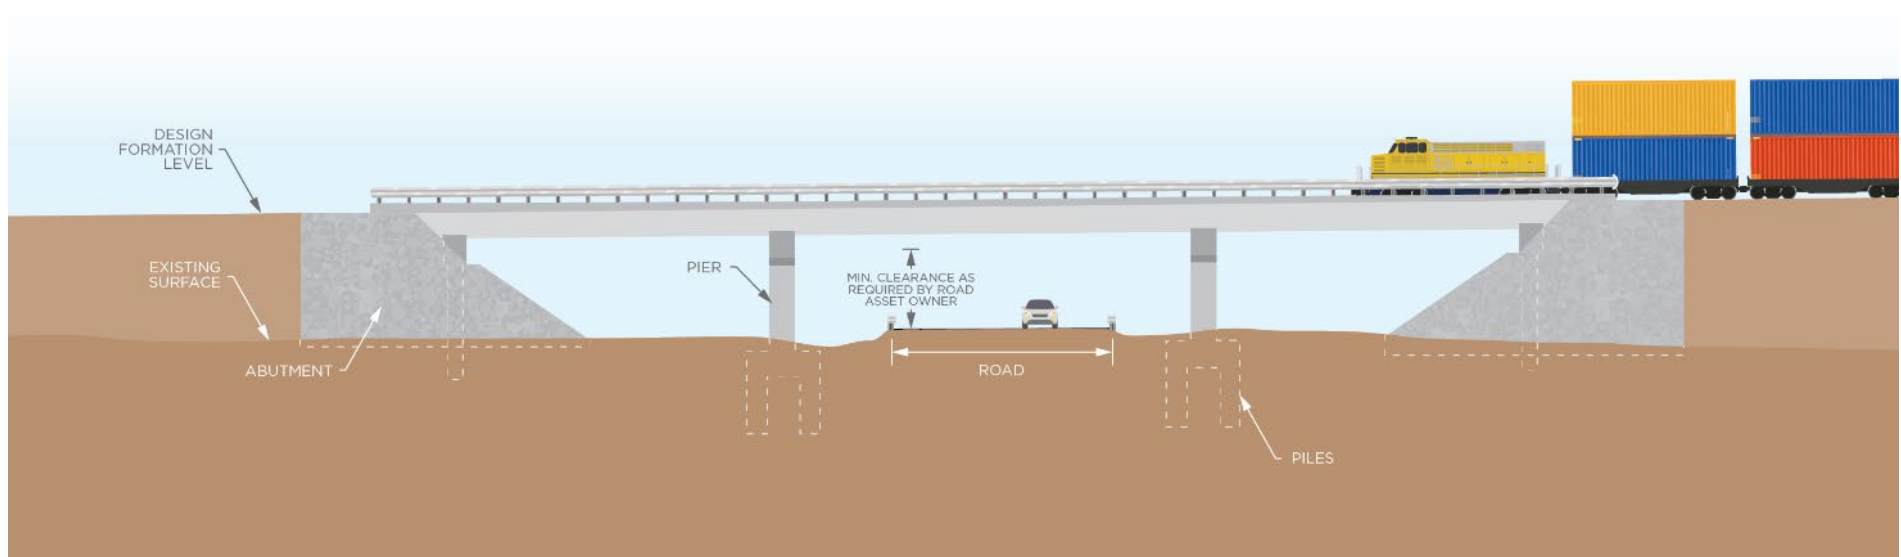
TYPICAL SECTION OF RAIL-OVER-ROAD BRIDGE STRUCTURE
